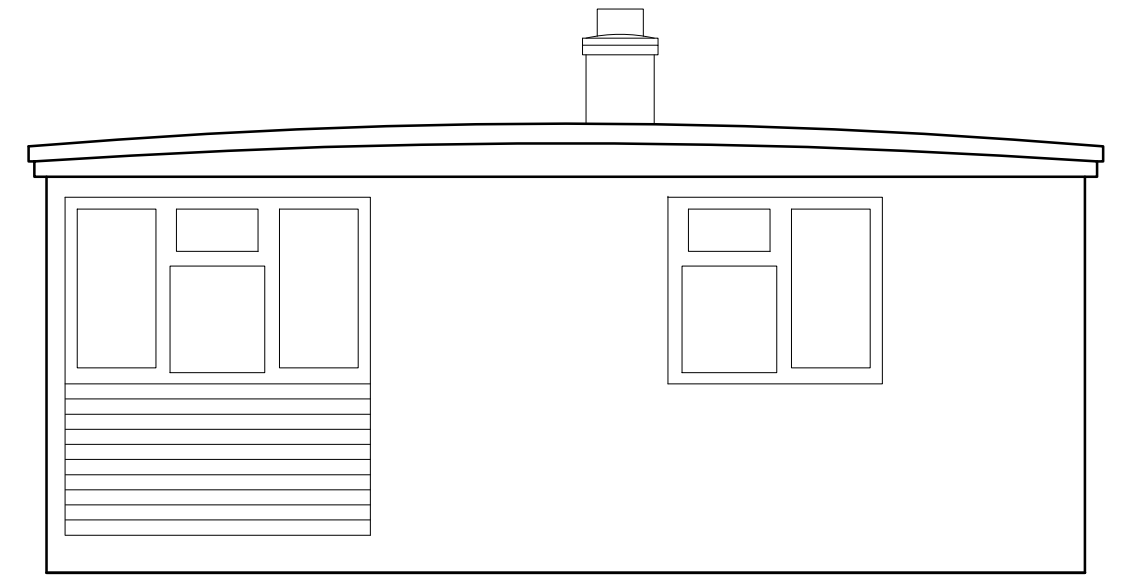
No. 43, The Bungalows, Stonebroom - plan
